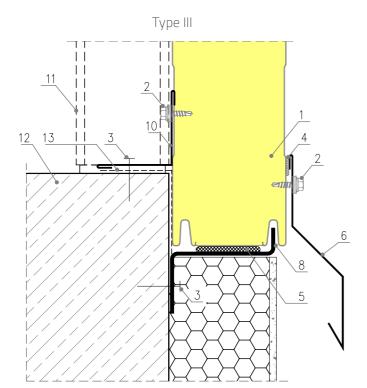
IzoWall PIR/PIR+; MWF; EPS - horizontal configuration, ground beam joint
